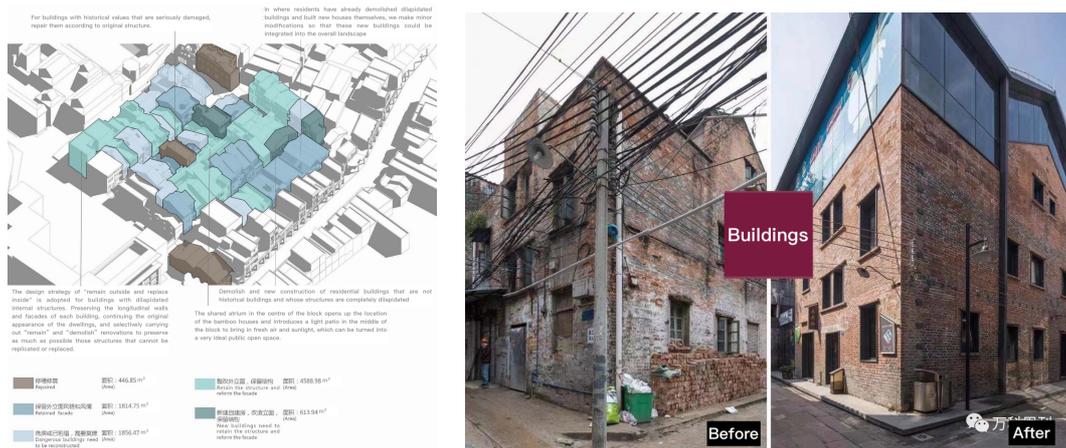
and 9b. Micro renovations of buildings within Yongqingfang (after ArchDaily, 2019; vankeweekly, 2018)
